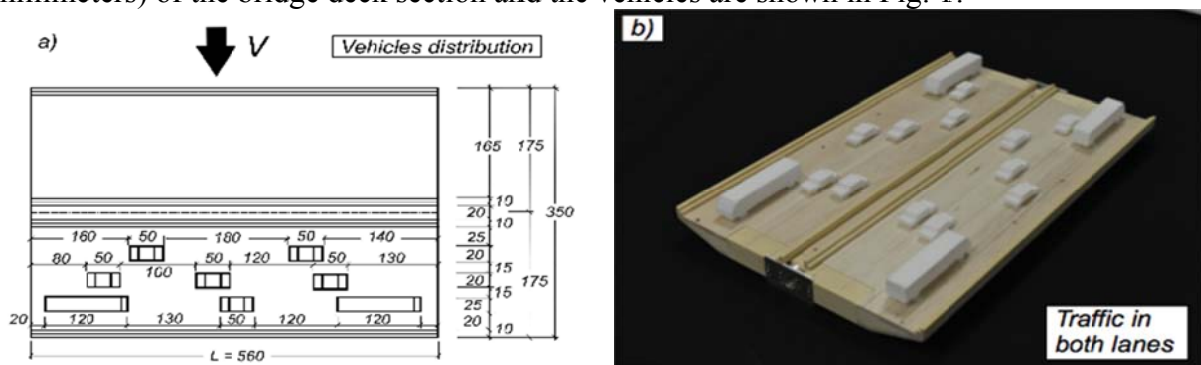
Bridge-section model dimensions and arrangement of vehicles on the bridge-section model.
